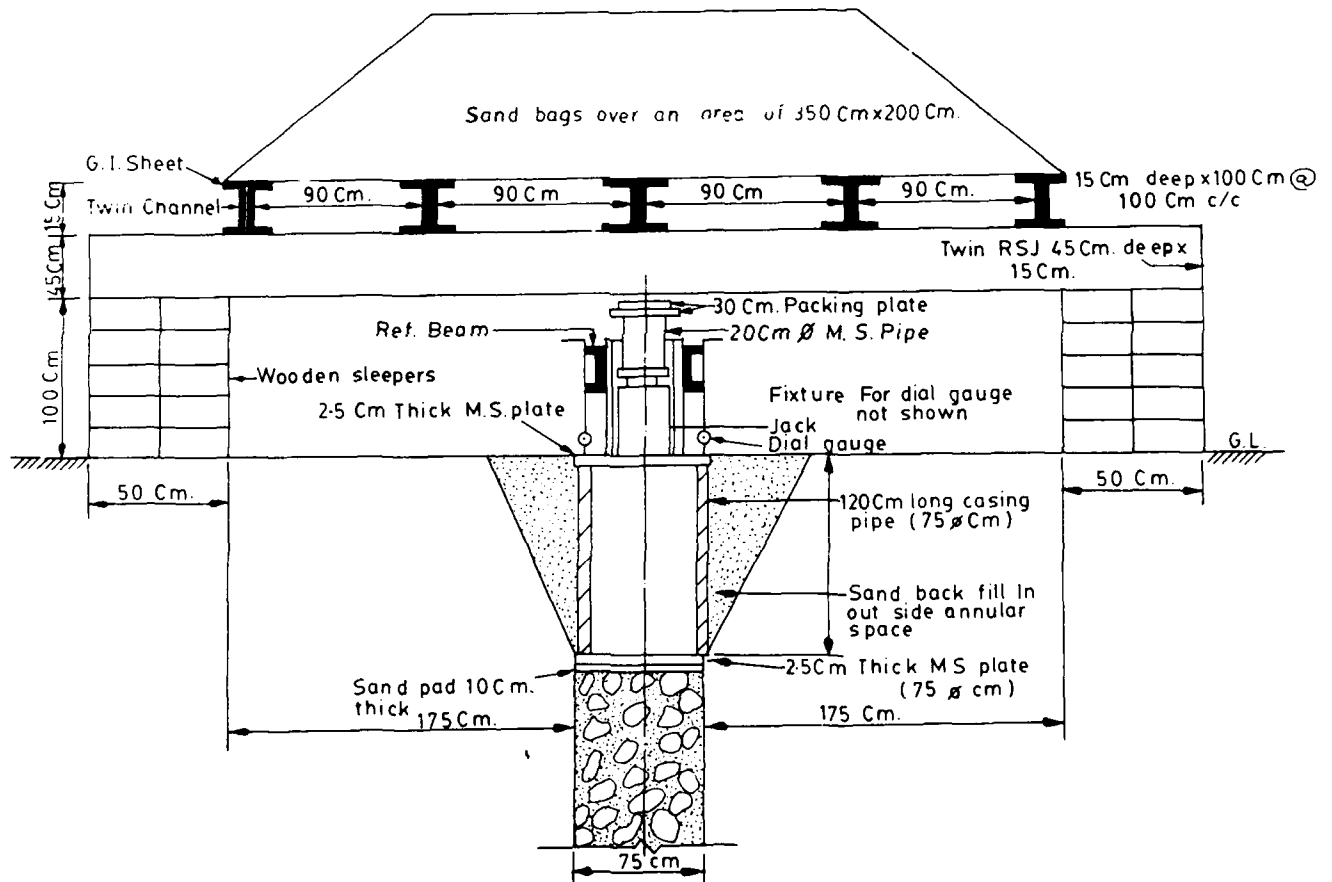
SINGLE STONE COLUMN LOAD TEST ARRANGEMENT
